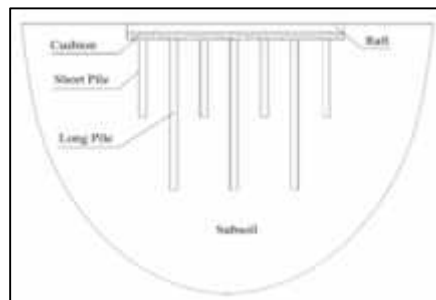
Cross section of the foundation model used by P. et al. [3]
